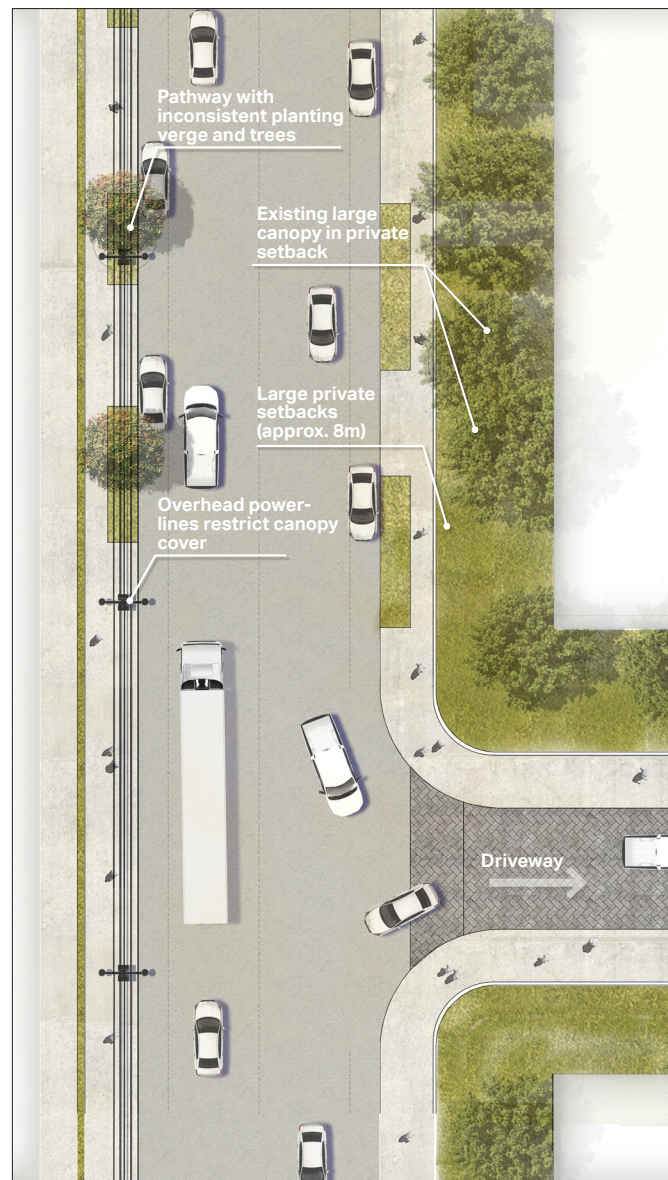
Existing Conditions Concept Plan (Source: AECOM, 2018)
